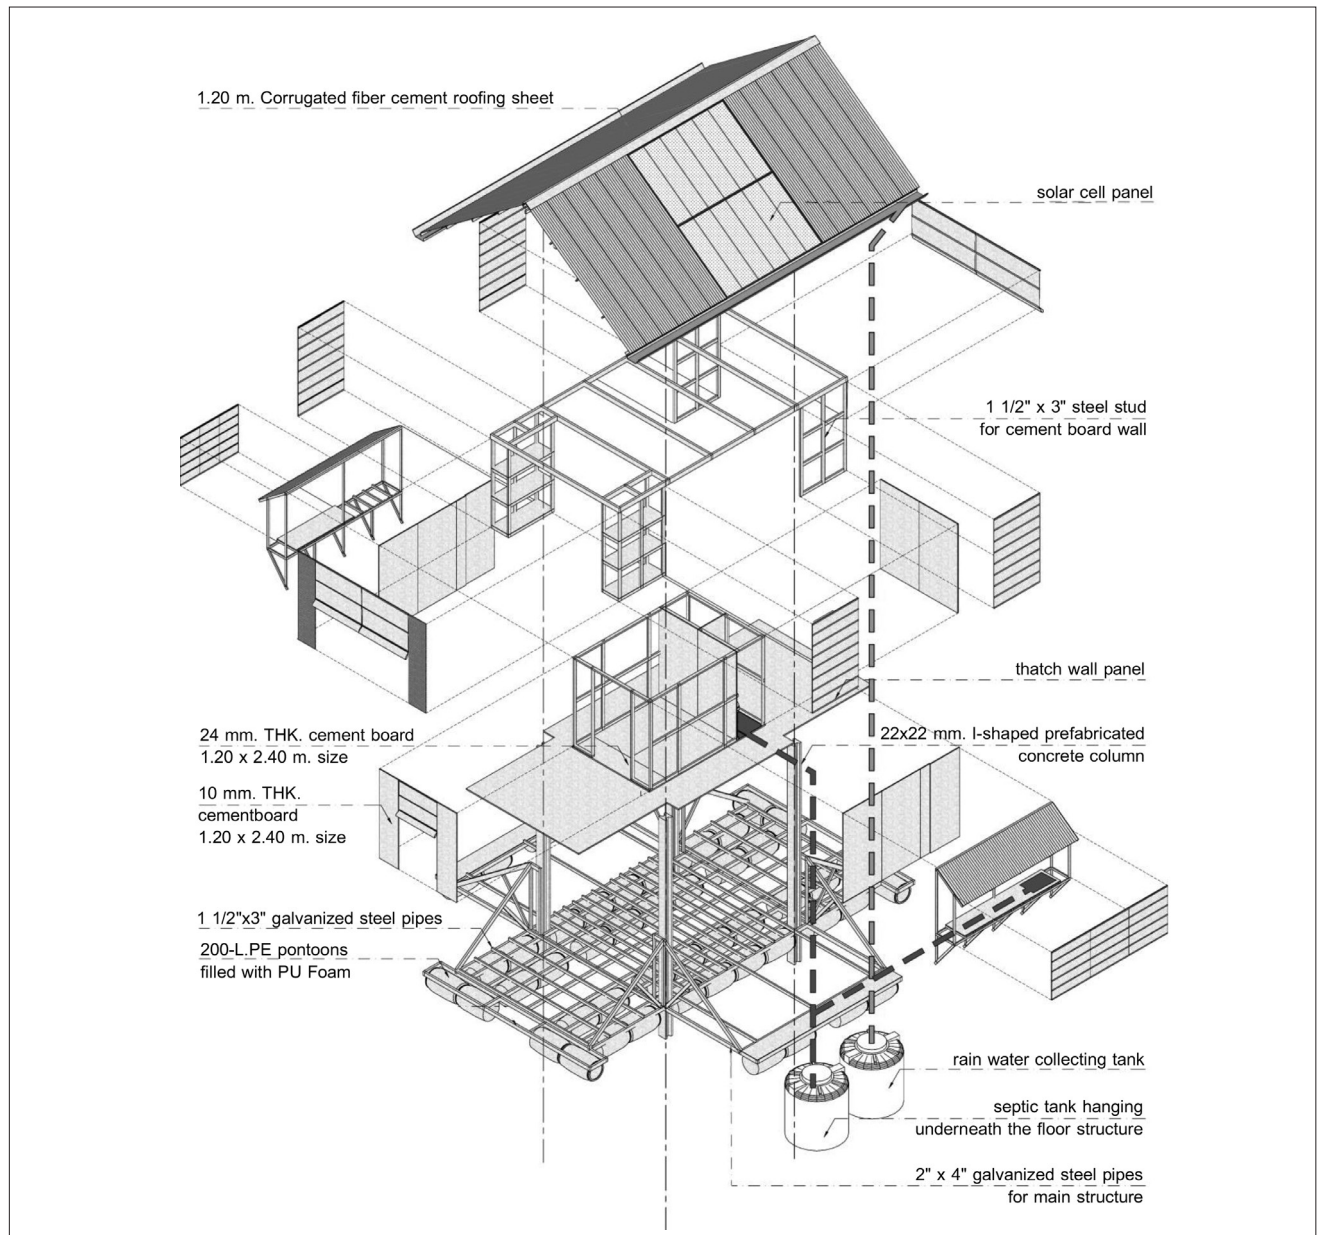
Exploded axonometric drawing of resilient house shown assemblage of each parts of building (Source: designed by the authors)
